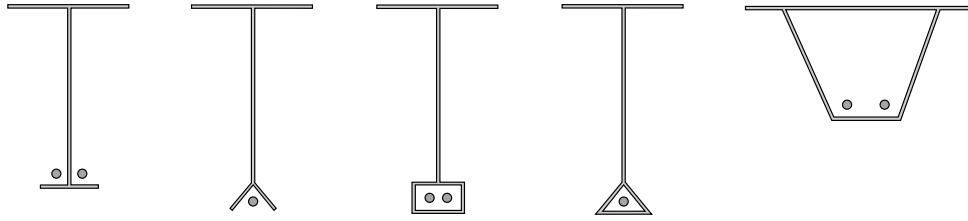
Cross-section profiles of mono-symmetric prestressed steel girders (Troitsky *et al.*, 1989).
